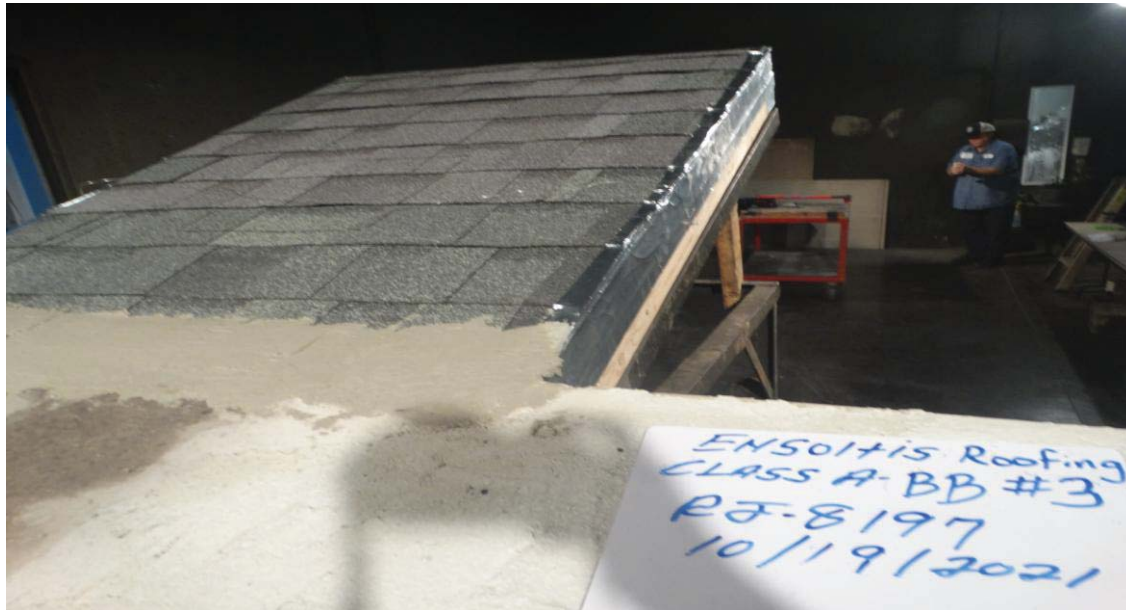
Ensoltis Above Roof Deck Thermal Insulation System.
